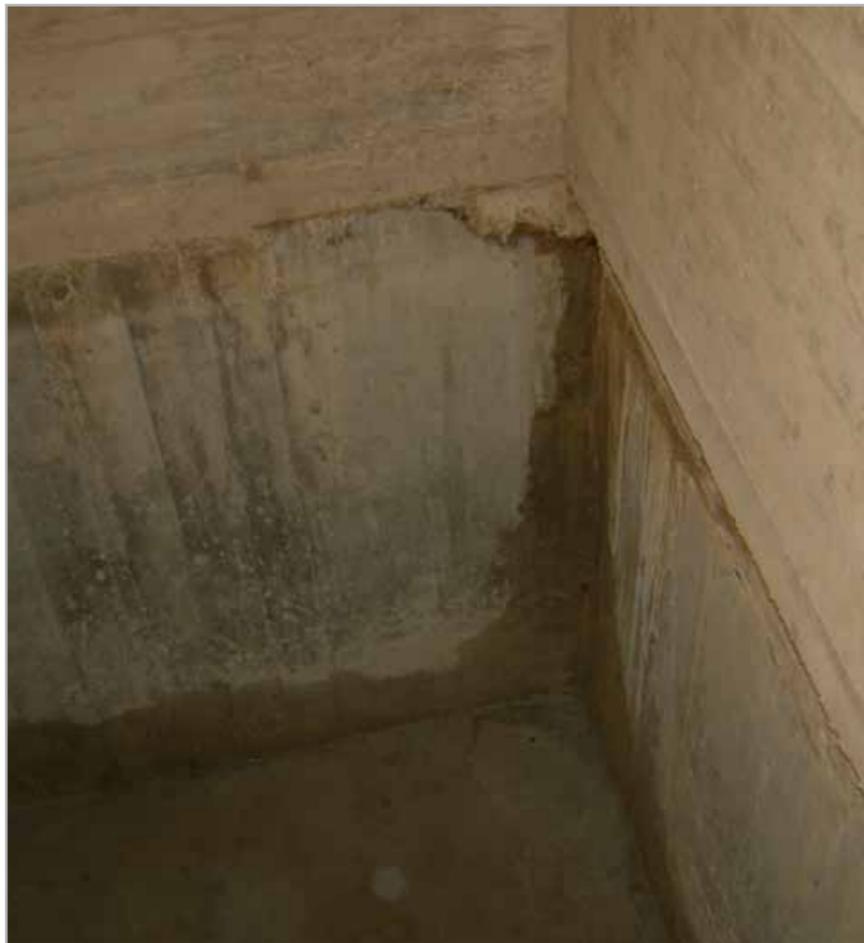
Infiltrations in correspondence with the construction joints in the reinforced concrete structure for a lift well
